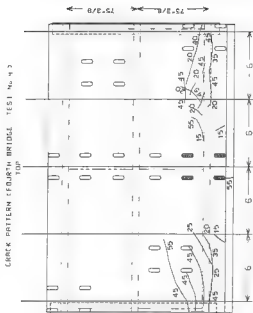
Top Cracking Pattern (Fourth Bridge - Test No 4)
